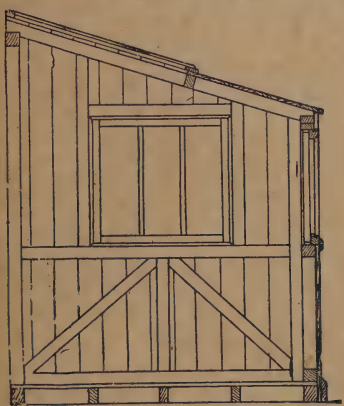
Cross Section on B B (Fig. 14) Showing Right-hand End
